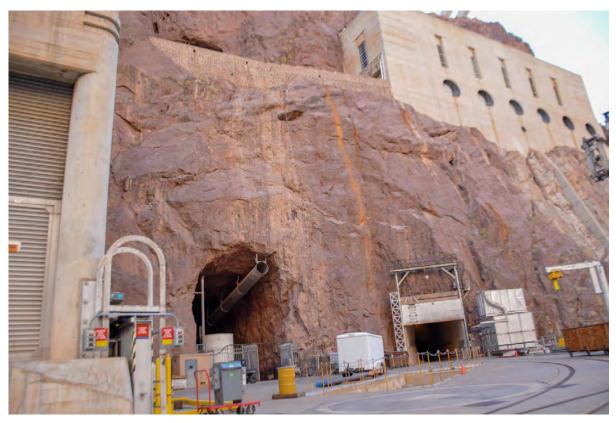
Tunnel in Arizona canyon wall where wastewater treatment system is located. Water treatment system is located in the upper Arizona valve house.
